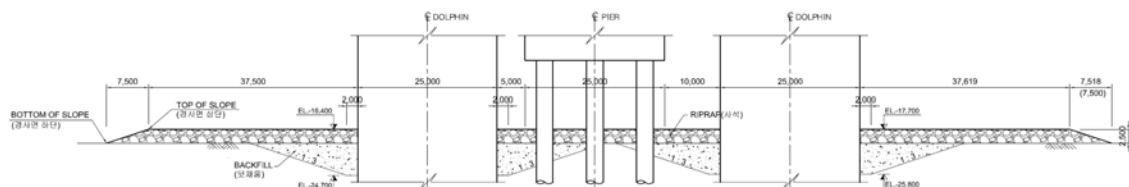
Cross-section of the riprap protection around the pier and dolphins
